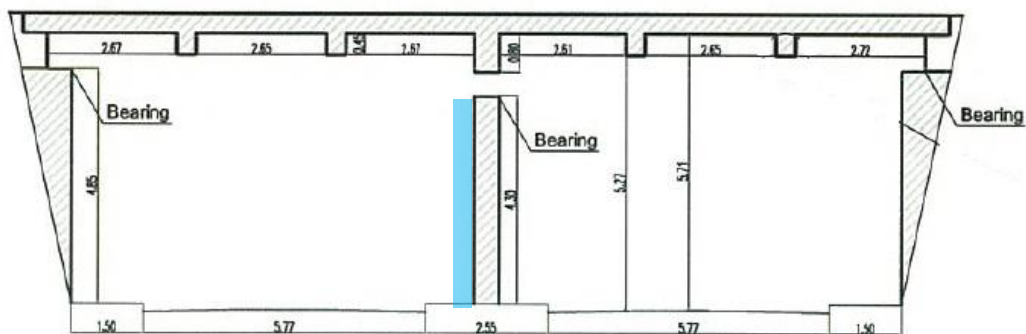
Disposition of Support columns in the span of bridge (section 3-3)
